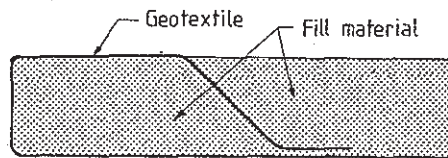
"Earth bag" at the edge of geotextile reinforced wall
